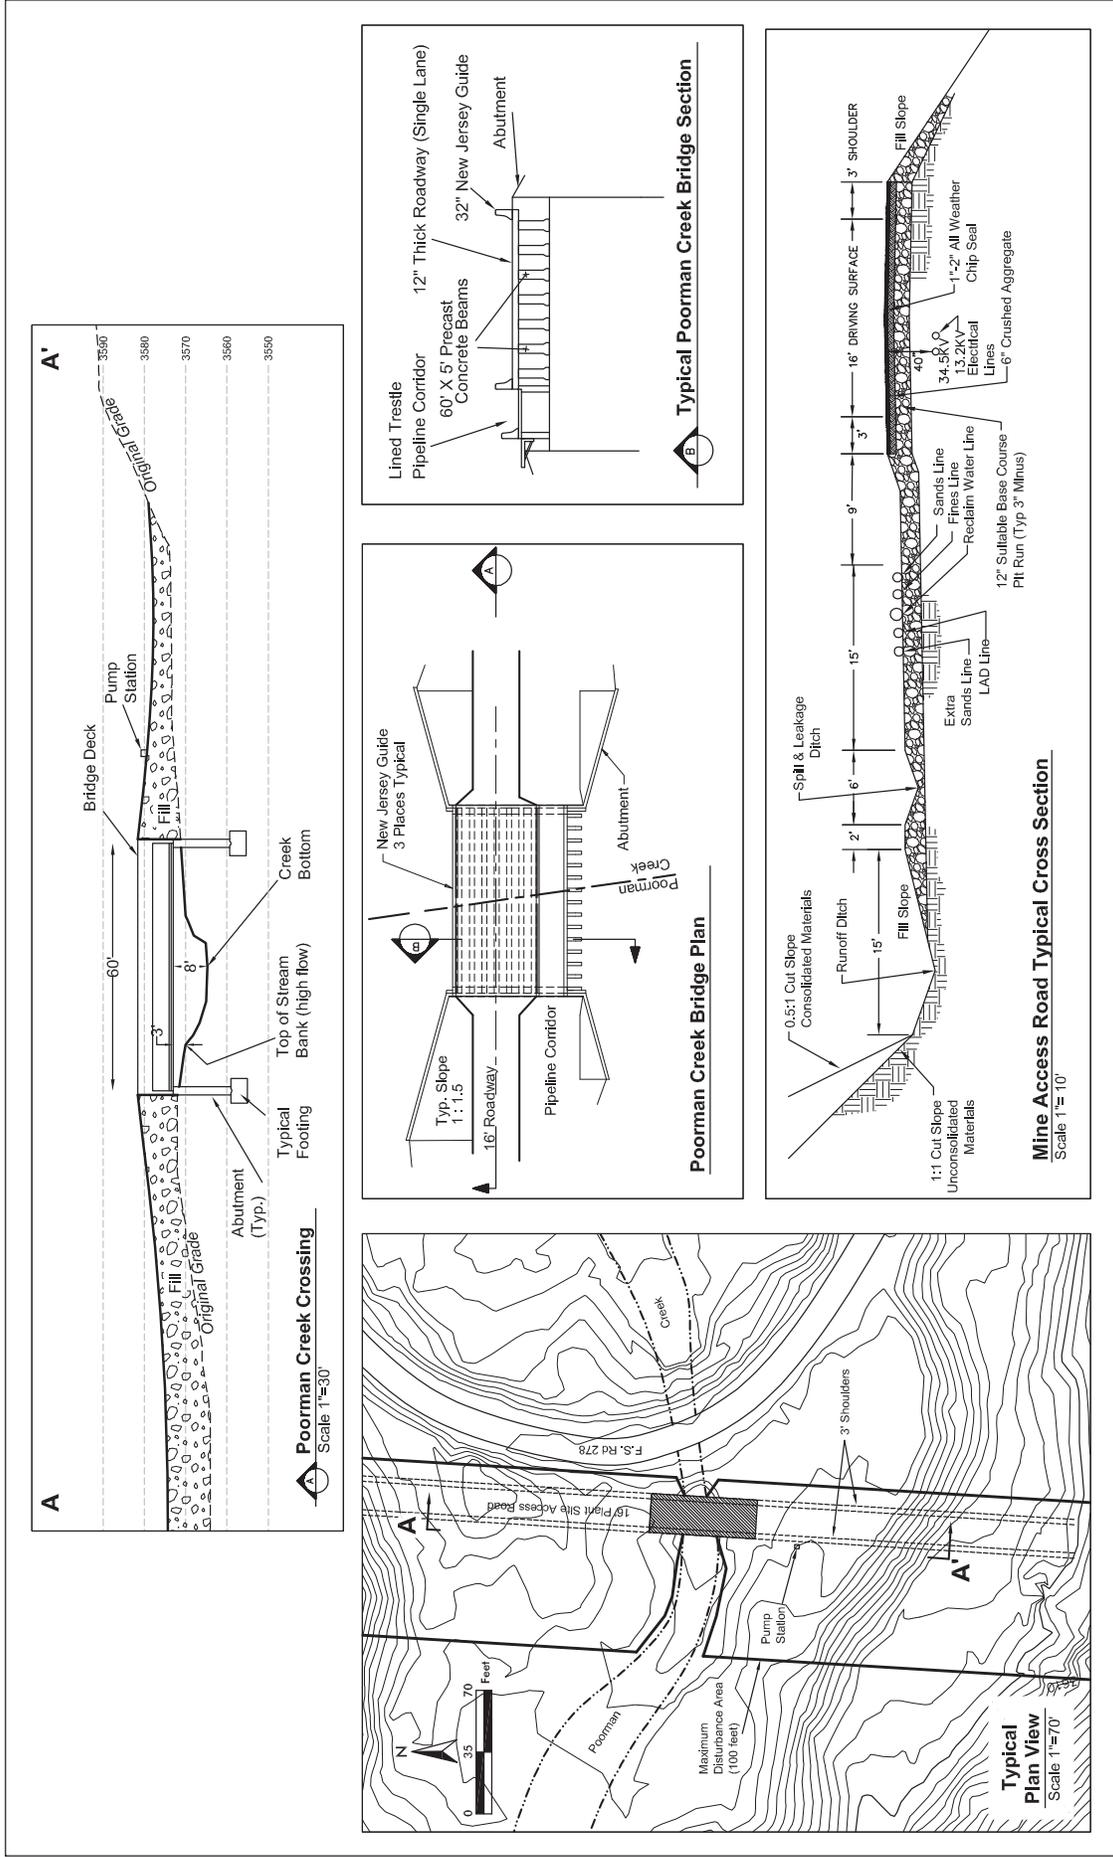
Details of Tailings Pipelines, Utility, and Access Road Corridor, Alternative 3
